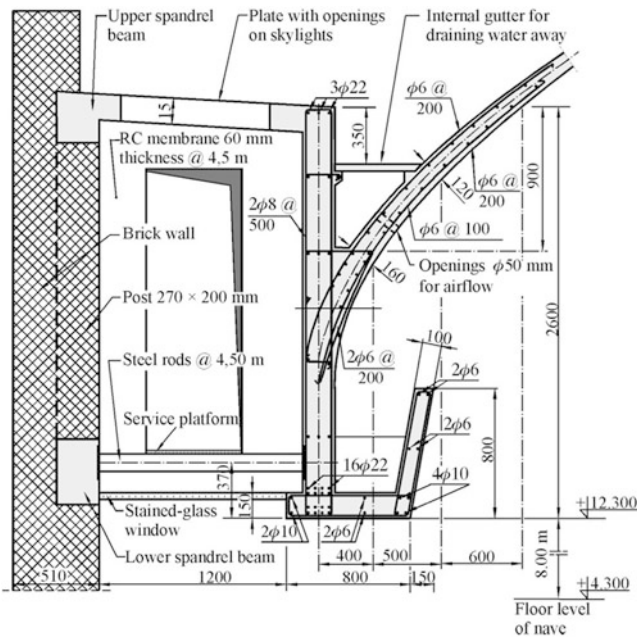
Reinforcement of the abutment beam and the dome in the support zone.
